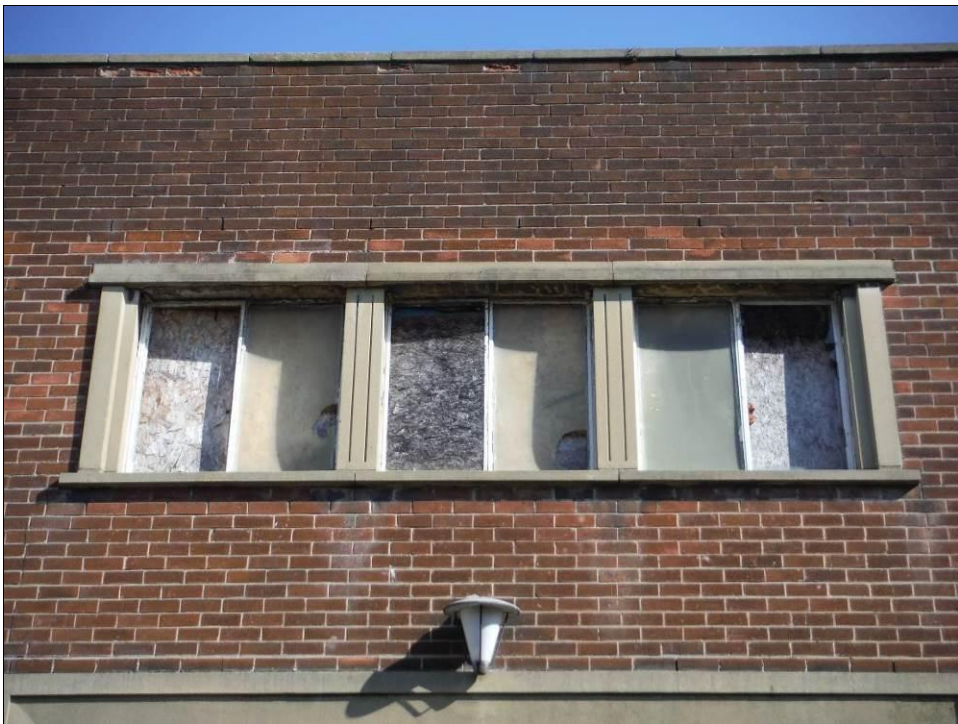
Detail of windows in the entrance block of the South East elevation of Building B.
